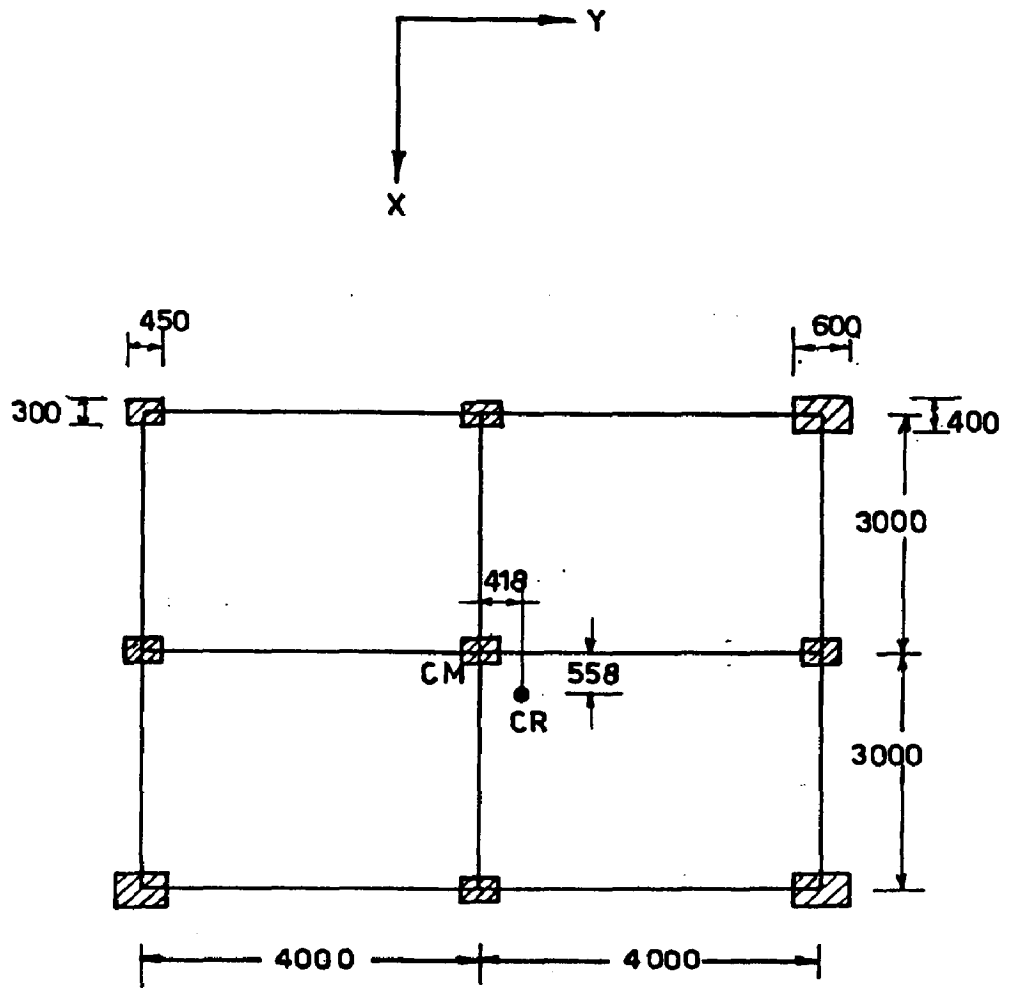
4 _ PROBLEM 2 - PLAN OF THE ASYMMETRIC BUILDING
